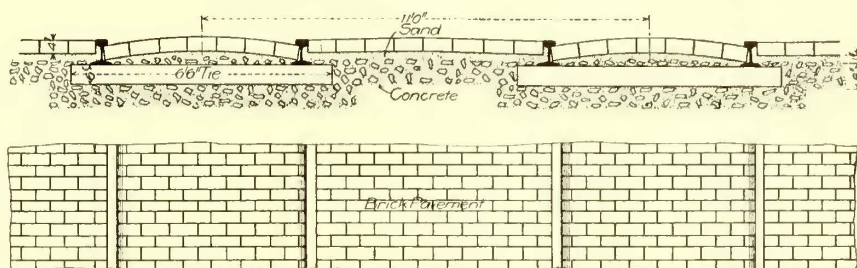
T-Rail Construction for Brick Paving in Milwaukee
